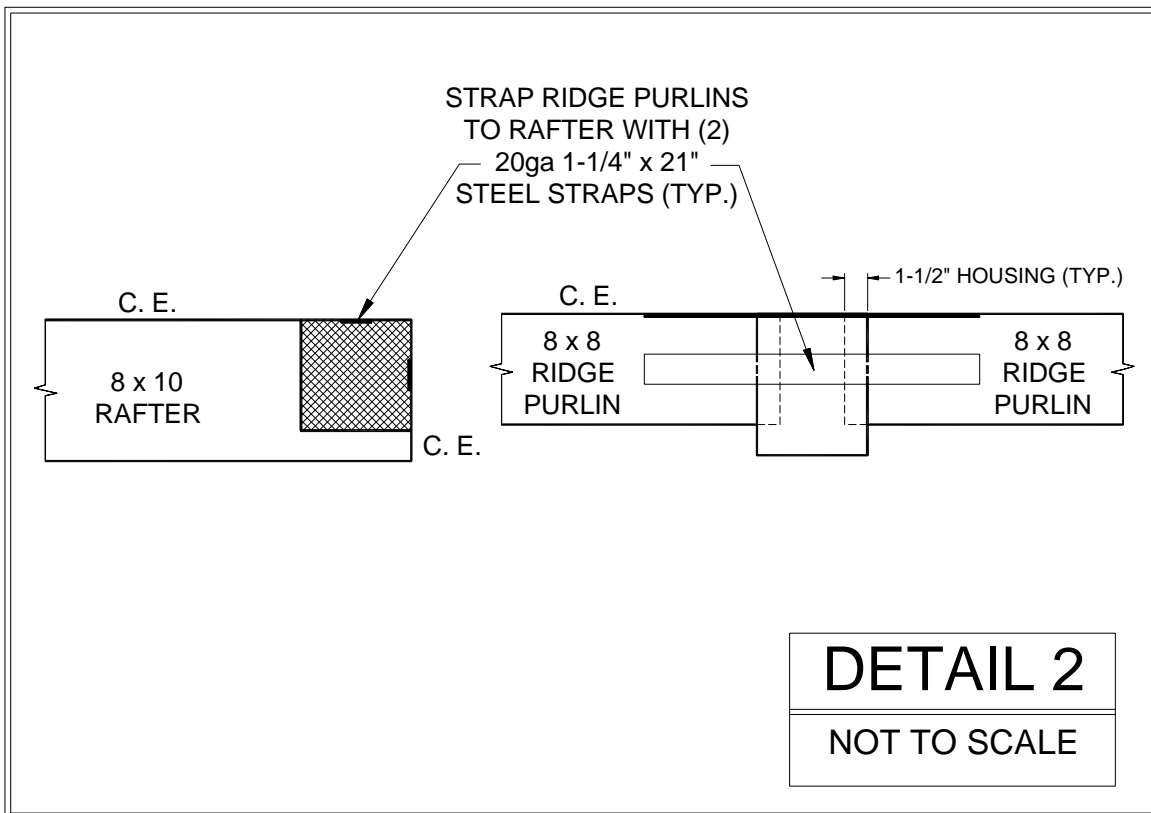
Example of typical center rafter to ridge purlin joint consisting of two housings cut into the rafter into which the ridge purlins fit and are held in place with two steel straps.
